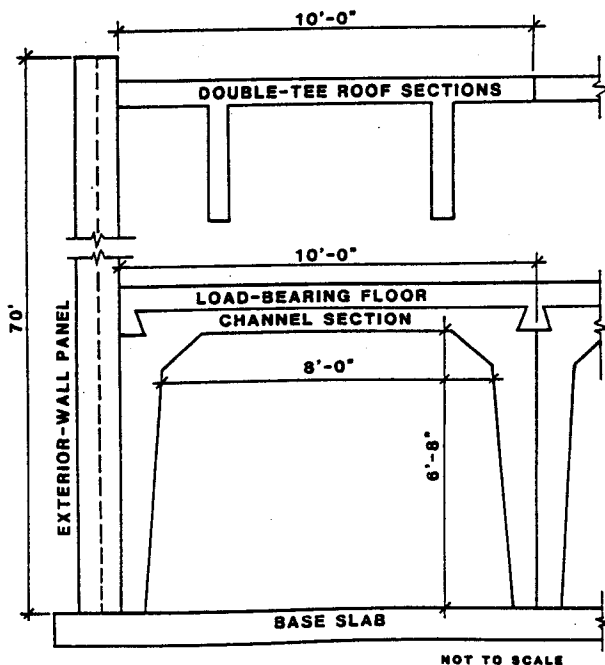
Elevation section showing base slab, floor-supporting channel sections, load bearing floor, and double-tee roof sections.
